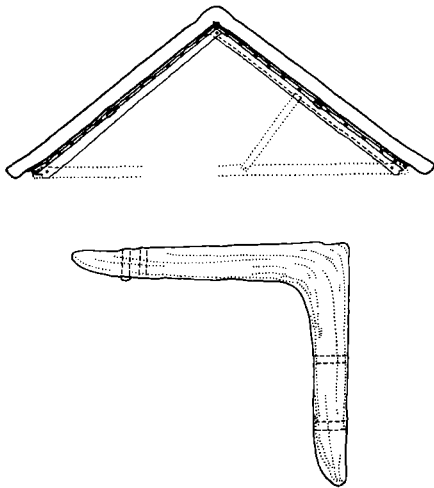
Reconstruction of a reused Romanesque roof truss from the 14th century Hedegård farm by Halkær. Wind-braces on the upper side of the rafters provided lengthwise stability to the roof. Section, scale 1:100. Naturally grown brace from the reused Hedegård timbers, closely related to the "knees" in the Viking ships. Scale 1:20. H.S. 1984.
